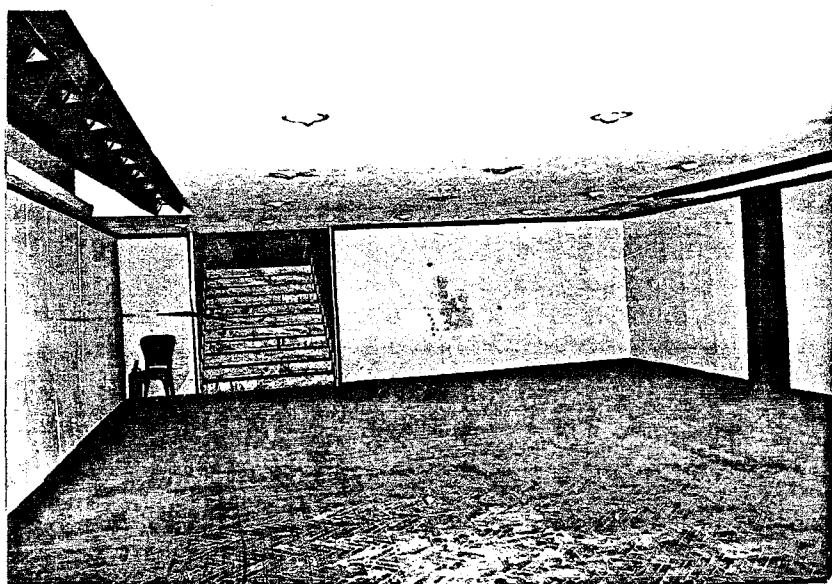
Upper floor - exhibition gallery (NE) (1987)
